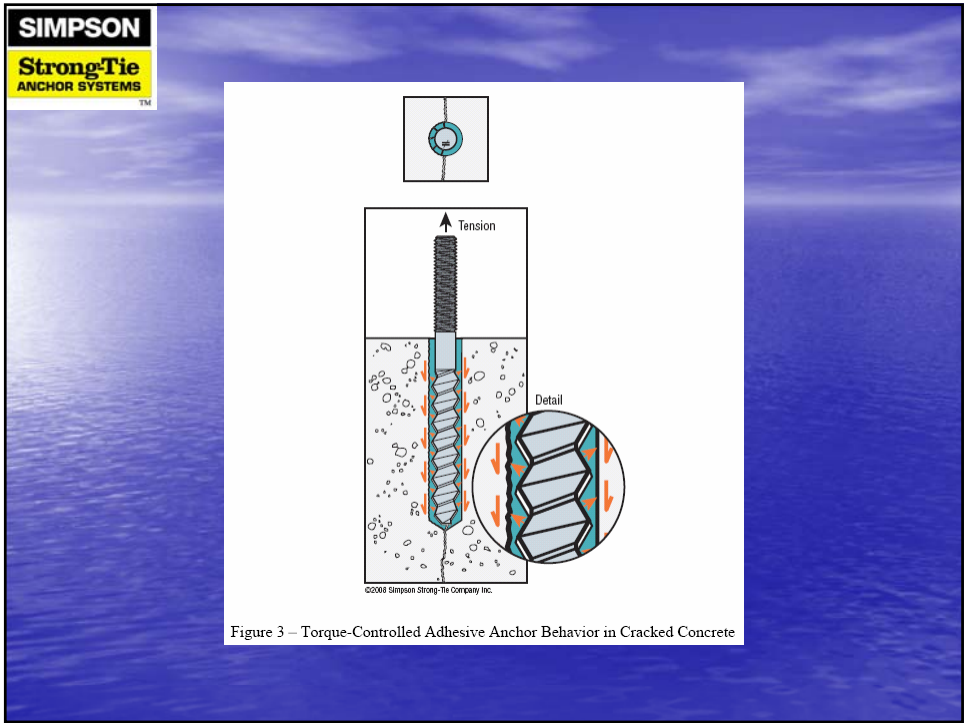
Torque-Controlled Adhesive Anchor Behavior in Cracked Concrete
